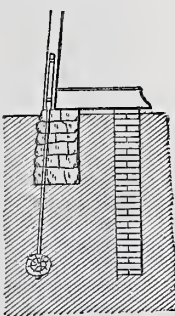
A Modification of Fig. 5, Showing a Different Plan of Anchoring.
